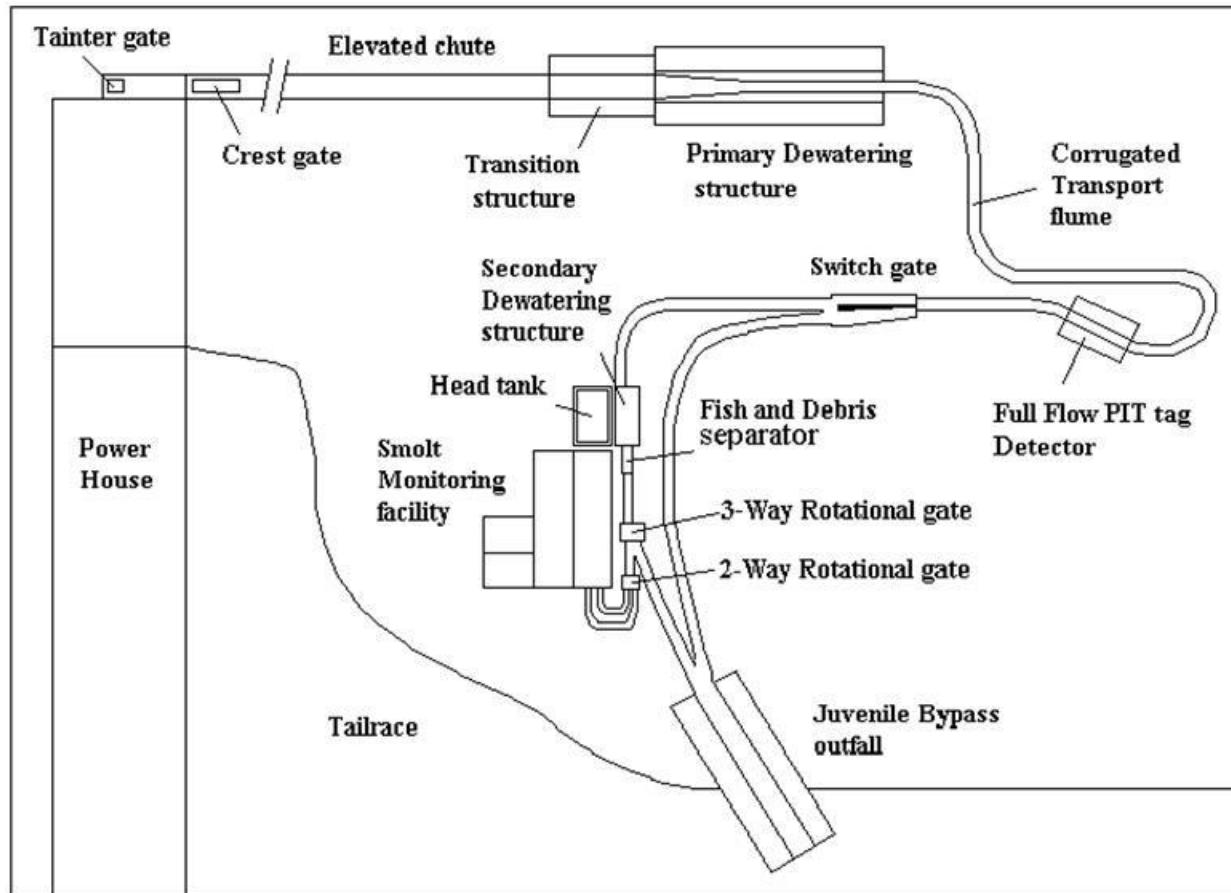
John Day Dam Smolt Juvenile Bypass Components and Monitoring Facility plan view (not to scale).
